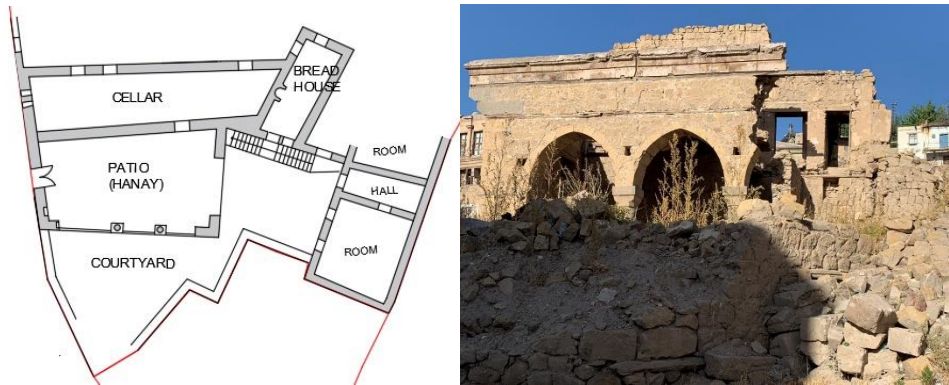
An example of a house with hanay on the corner of Malik Street in Kayabasi district (the sketch belongs to the author). Partial survey could be taken as part of the house was destroyed, September 2022 (author archive)
